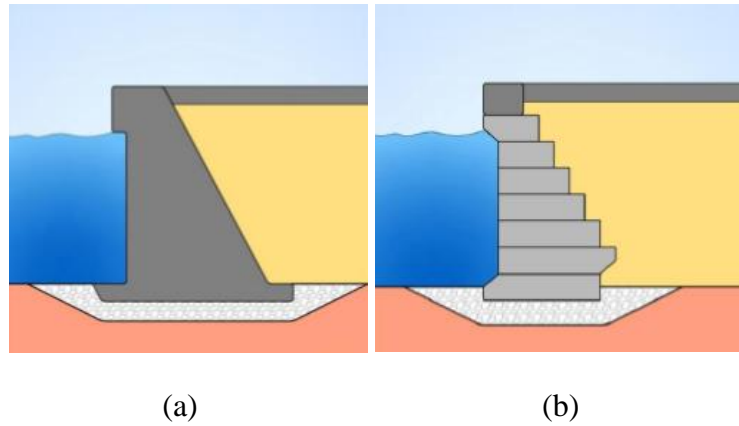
Gravity wall structures a) monolithic b) block wall (PIANC [28])
